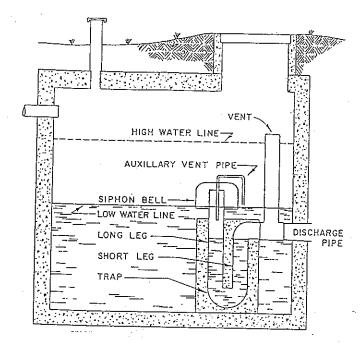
Cross Section of a Dose Chamber Showing a Miller Type Siphon
